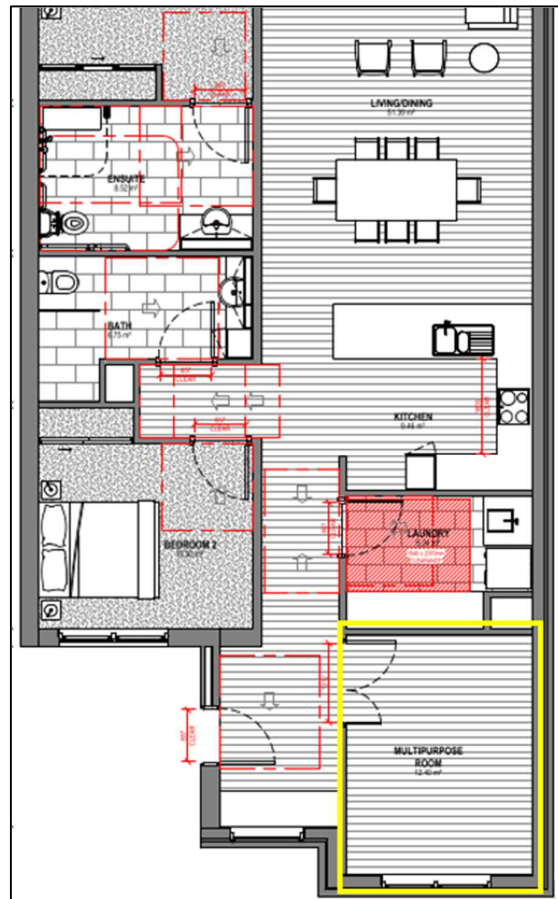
Extract of typical "Type 2" unit with Multipurpose Room highlighted yellow
